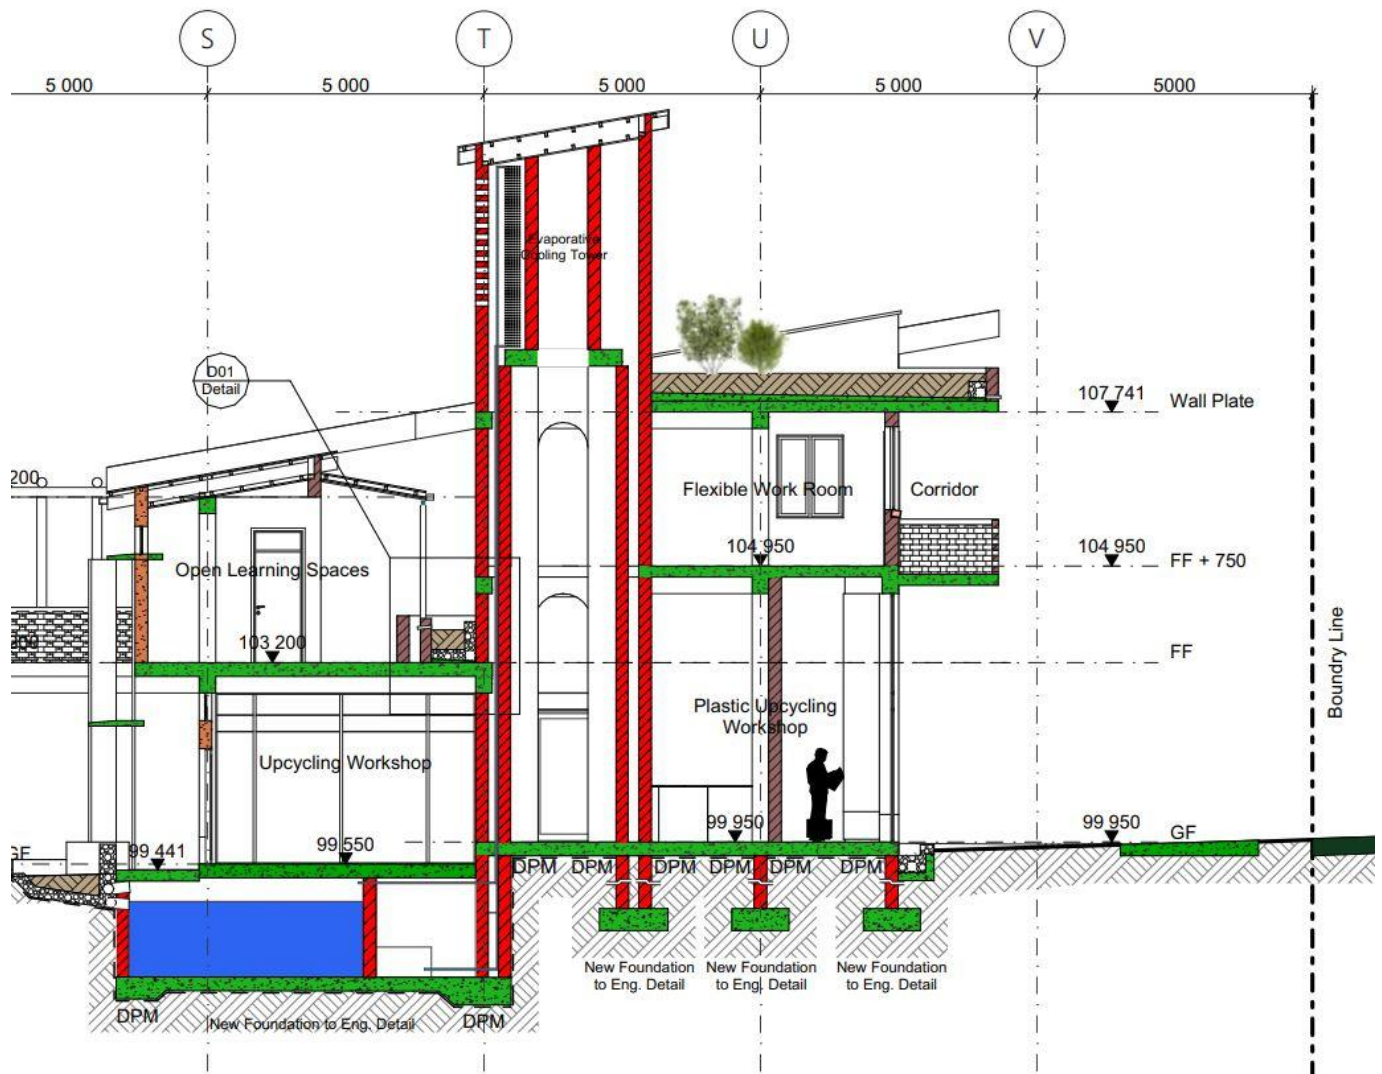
Detail section through the upcycling workshop (ground floor), the thermally assisted building service (TABS) tower and the education spaces (first floor). The bioswale gutter runs through the first floor as a water filter and biophilic intervention (Author 2023).
